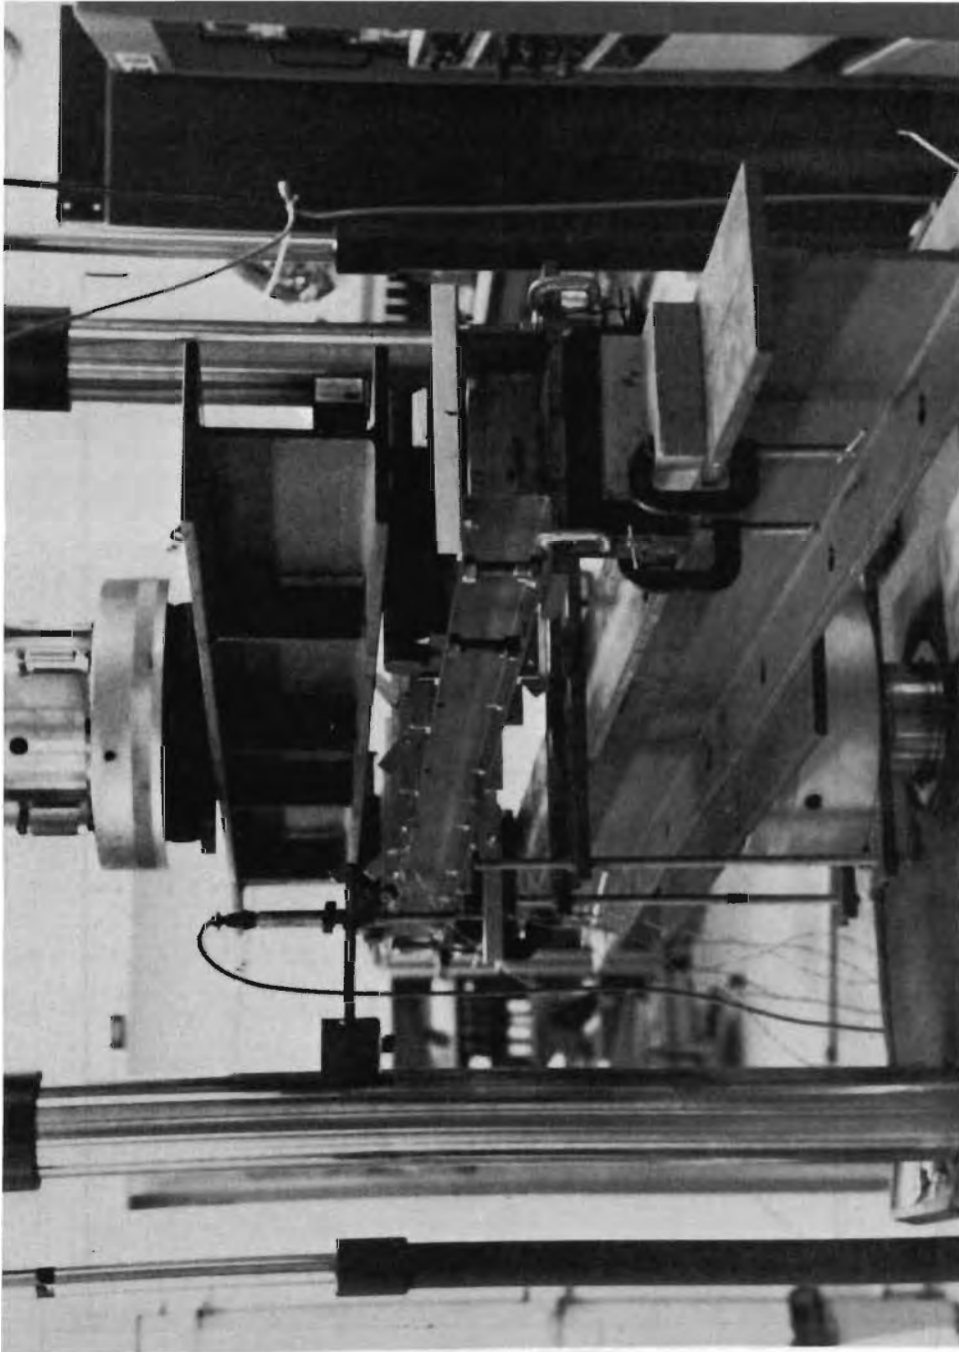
Photograph of Test Setup for Channel Beam Specimens
